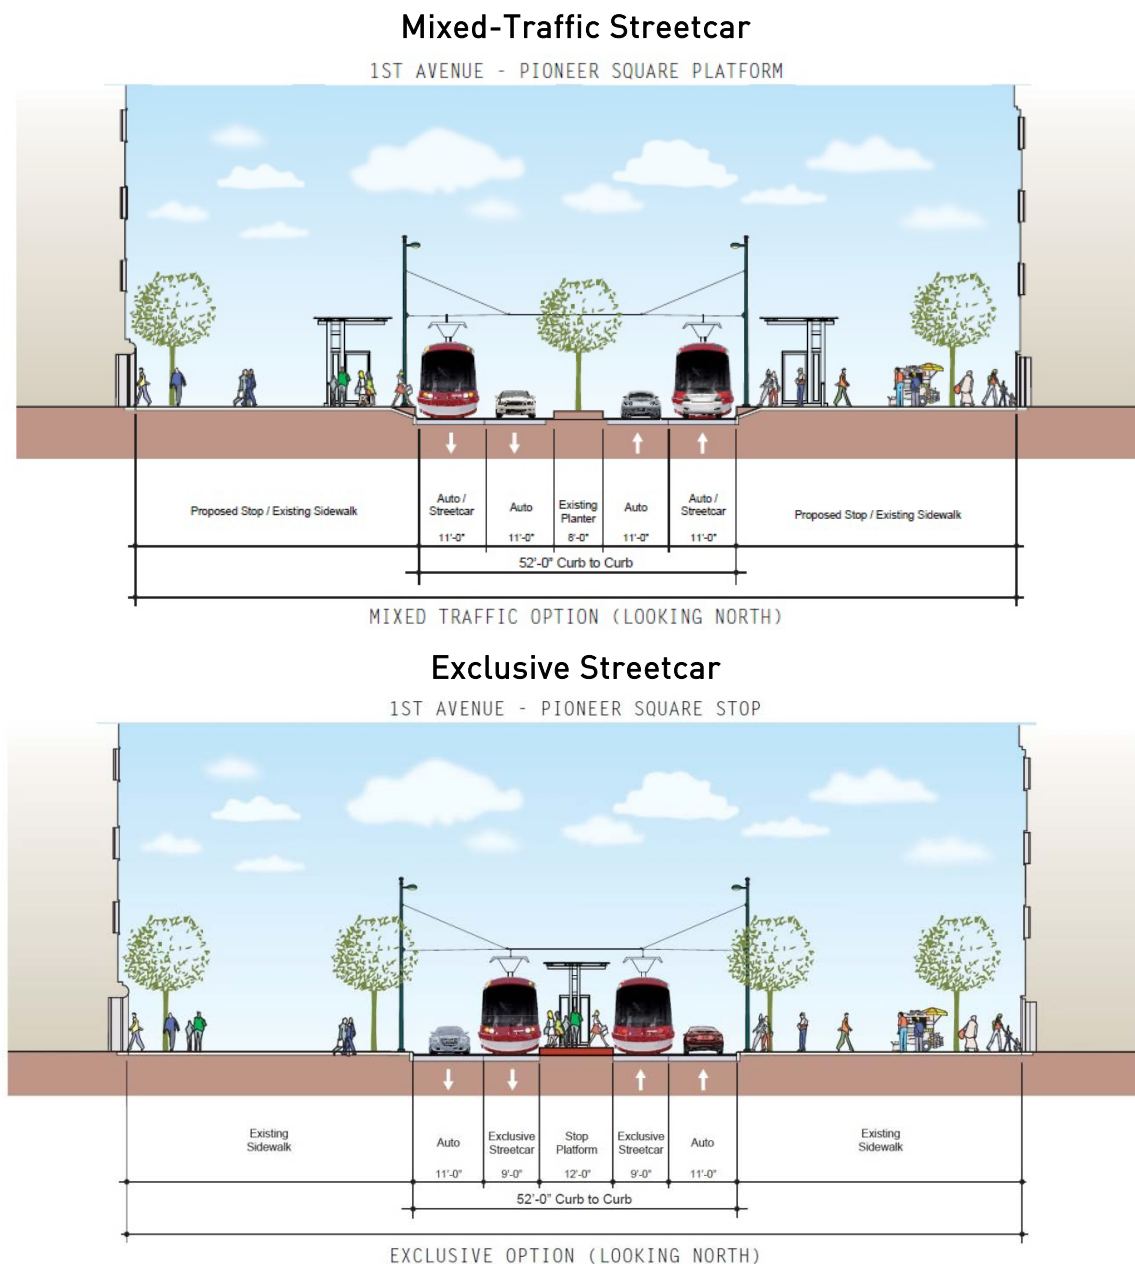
Typical 1st Avenue Cross Sections at Stops
